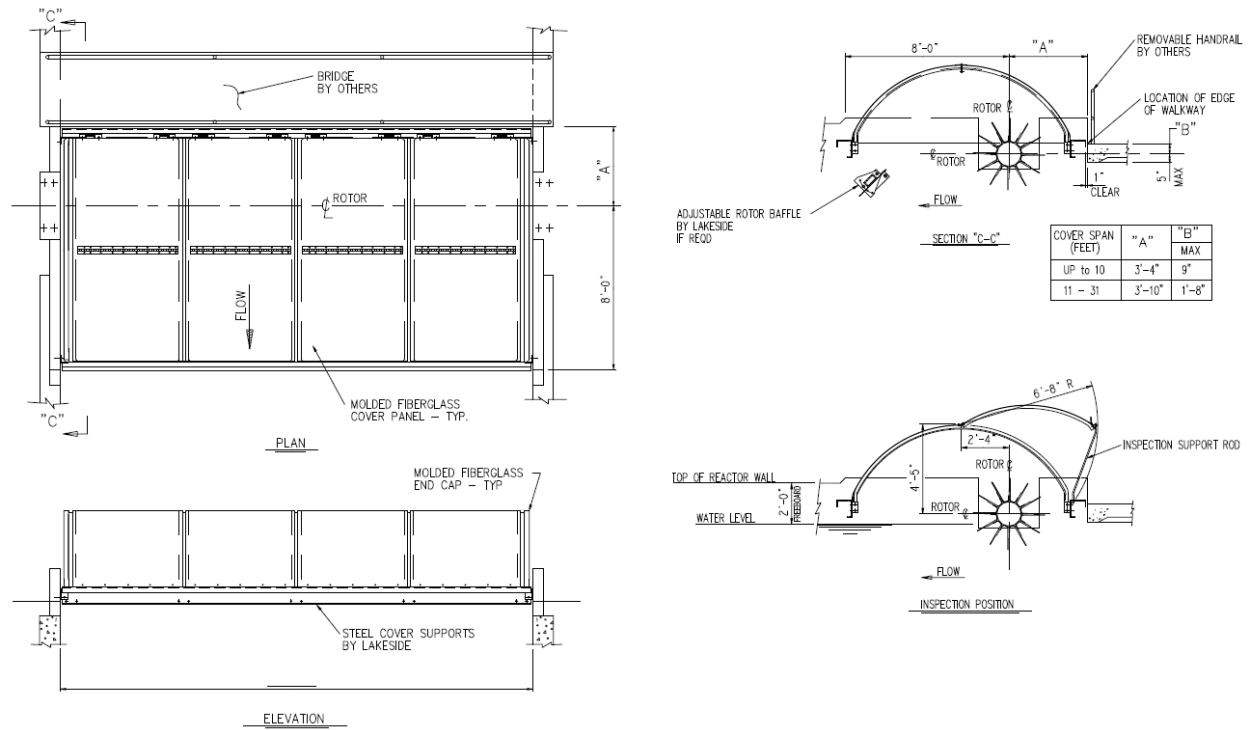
Lakeside Rotor Aerator Assembly Diagram
